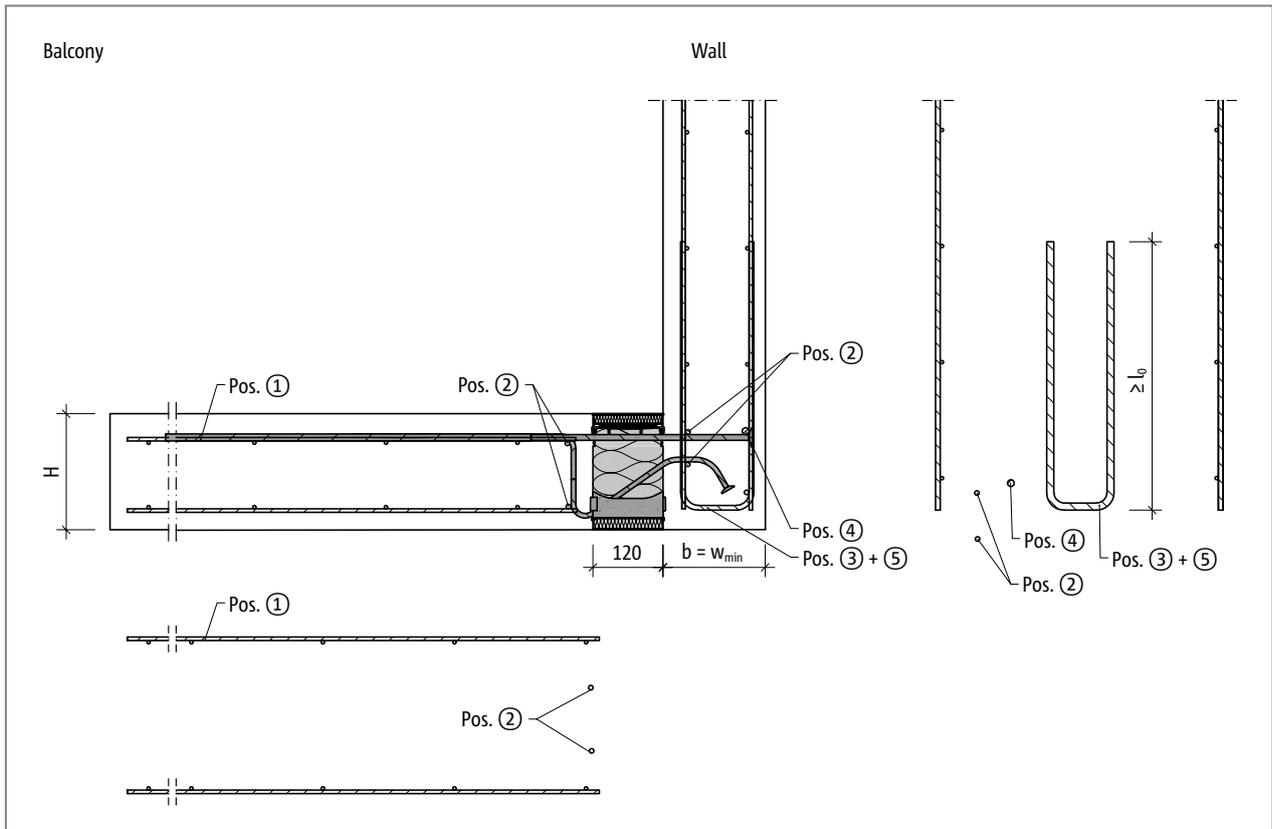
Schöck Isokorb® XT type K-U: On-site reinforcement for wall connection upwards with minimum structural element dimension ($w_{vorh} = w_{min}$)
